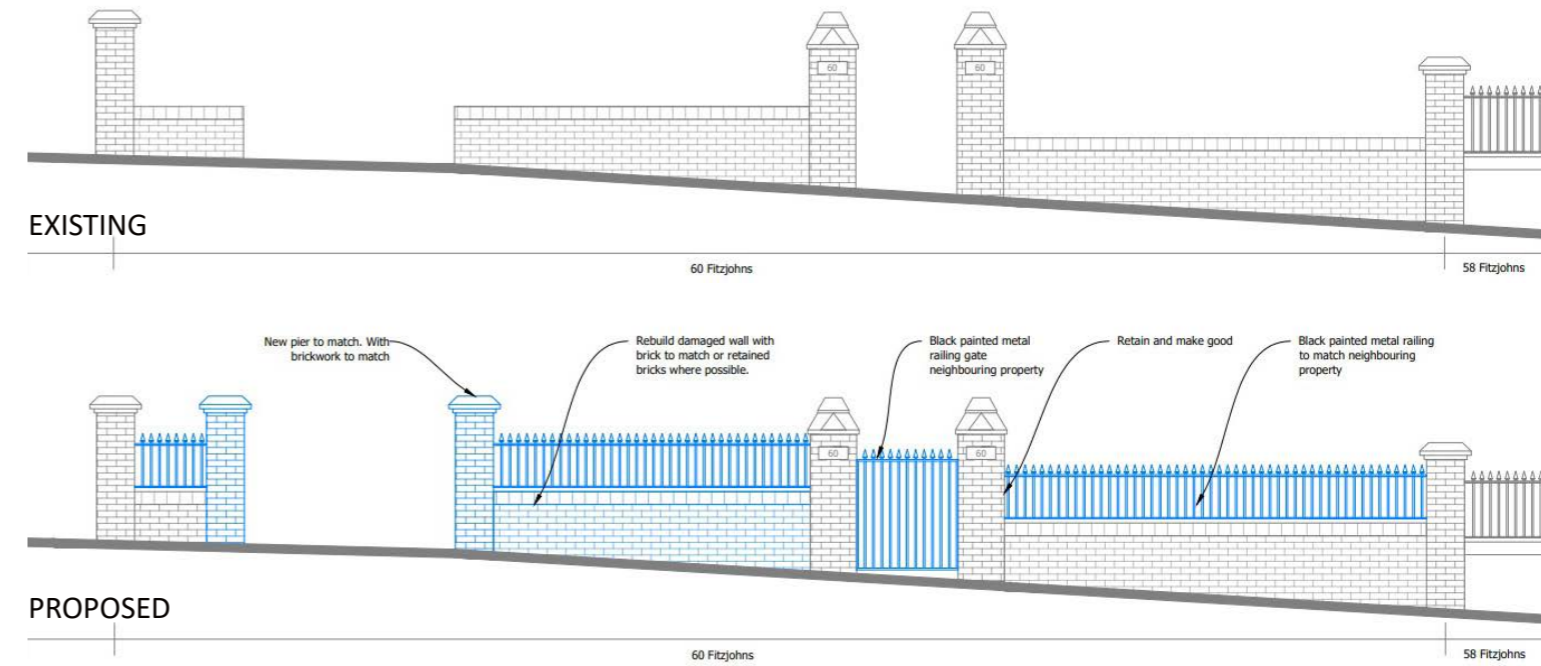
60 Fitzjohn's Avenue - Existing and Proposed front brick wall
